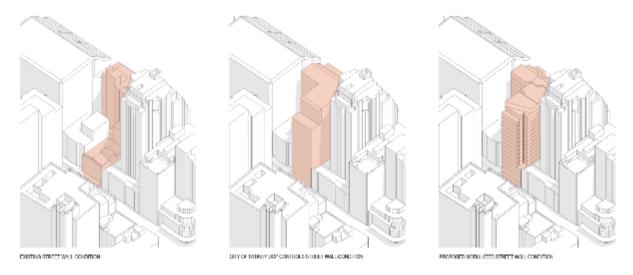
Isometrics of existing developments along Castlereagh Street, including the existing site, the DCP compliant built form and the proposed development
